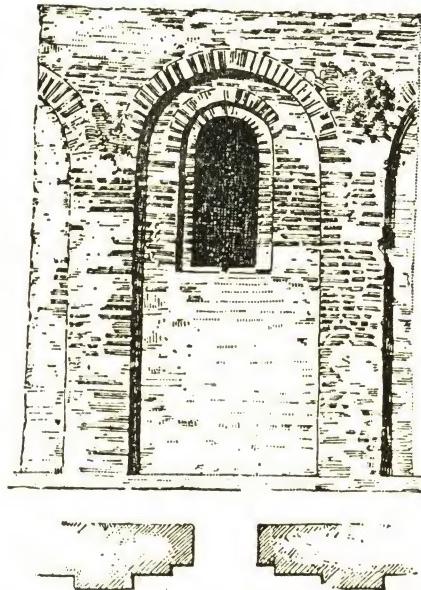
Detail of Aisle Wall, Santa Maria della Caccia, Pavia.
